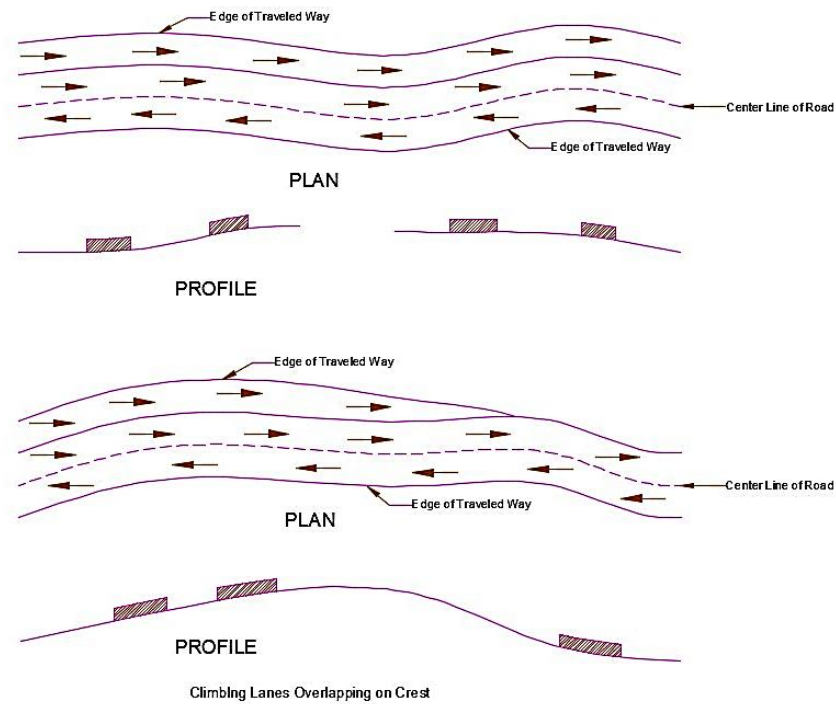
Plan and profile view of the existing climbing lane along CRWB highway
